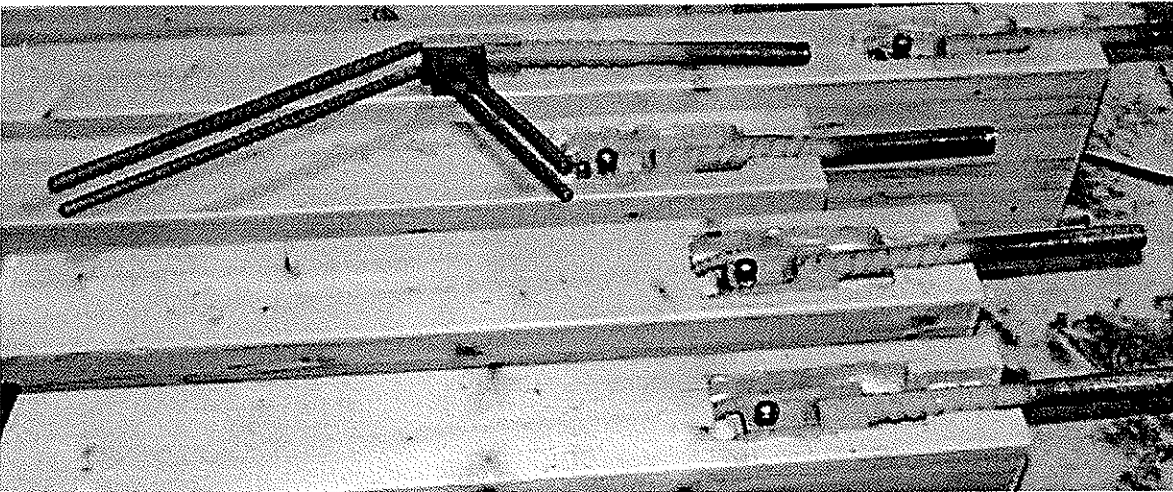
Mortised V-connections for tension members assembled without adhesive for checking.
